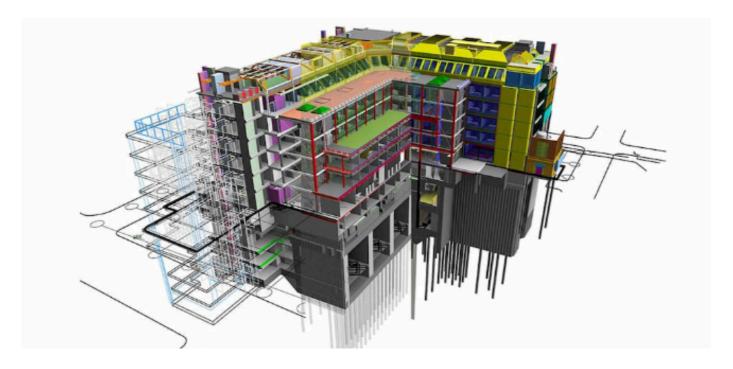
Using BIM engineering software to design structures (Source: Point Group)
